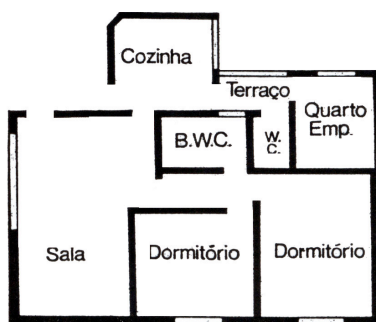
Example of floor plan with the aforementioned standardized features: apartment building by unknown author constructed by Planorte Construtora e Comercial on Rua Santa Cruz, Vila Mariana, São Paulo (Source: Folha de São Paulo, 1972. In APARTAMENTOS database – Nomads.usp).
